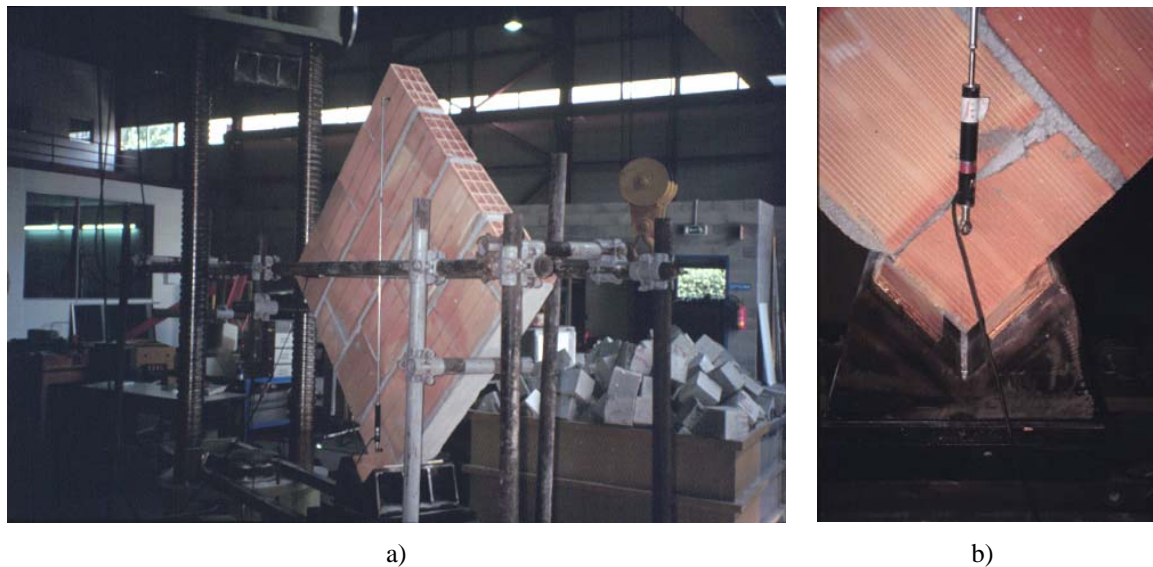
Diagonal compression test: a) testing set-up; b) instrumentation and loading shoe detail
